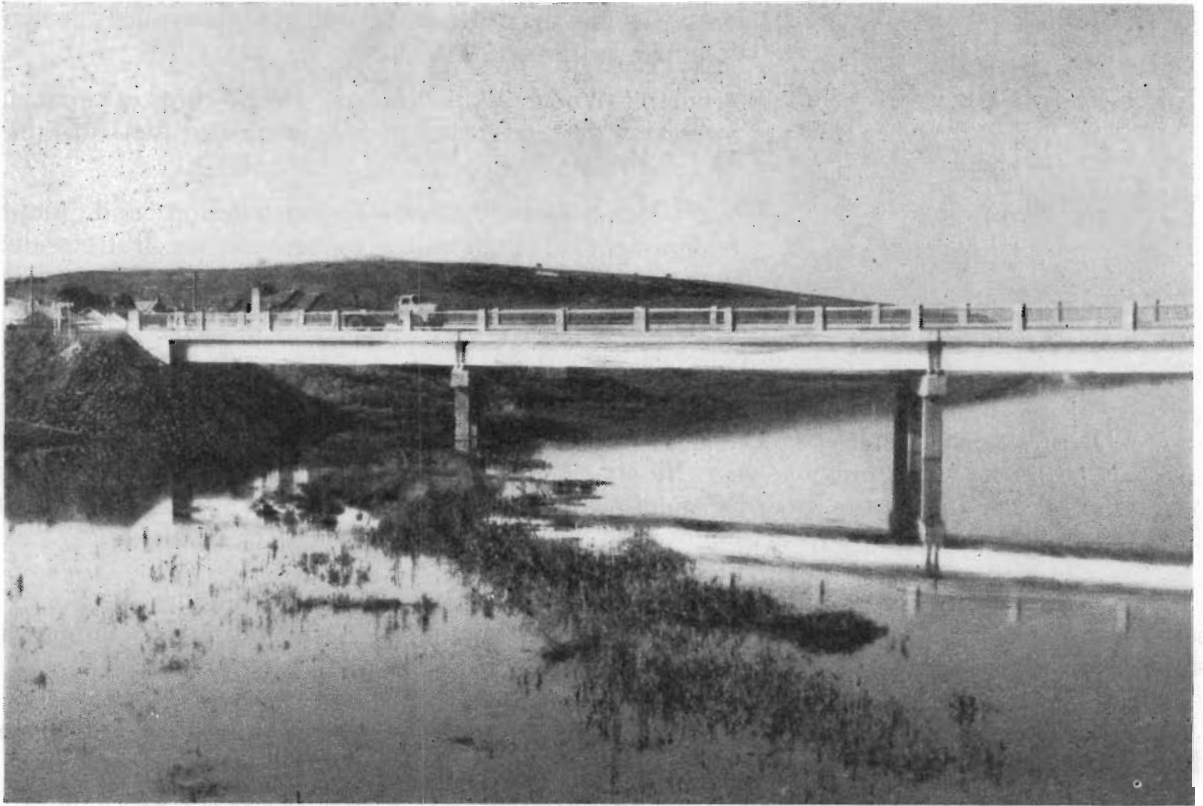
Princes Highway West—Bridge over Merri River at Dennington.
